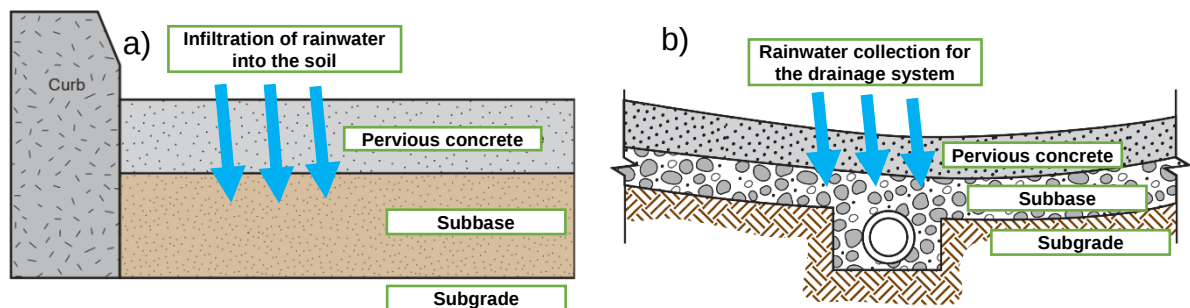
Example of cross-sections of drainage arrangements with pervious concrete: a) Infiltration of rainwater into the soil; b) Rainwater collection for the drainage system (Adapted from Tennis et al. [2]).
